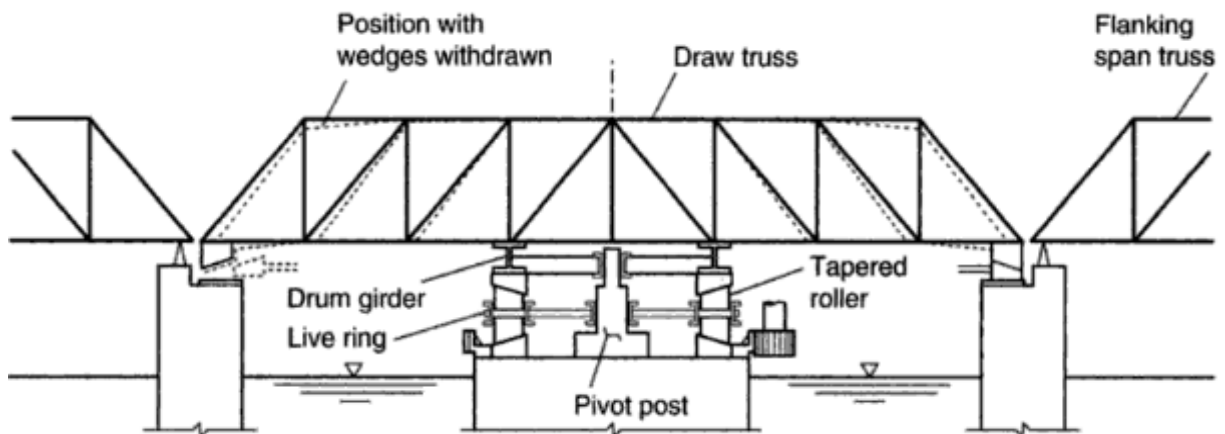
Rim bearing swing bridge (Ryall, Parke, & Harding, 2000)
